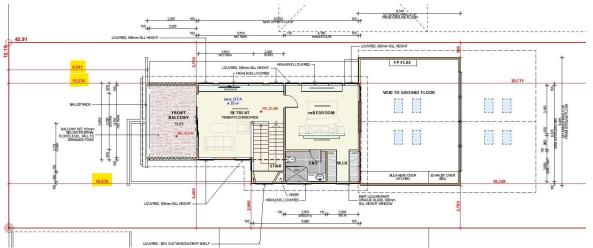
First Floor Plan – Extract of DA-104 – Front Setbacks
